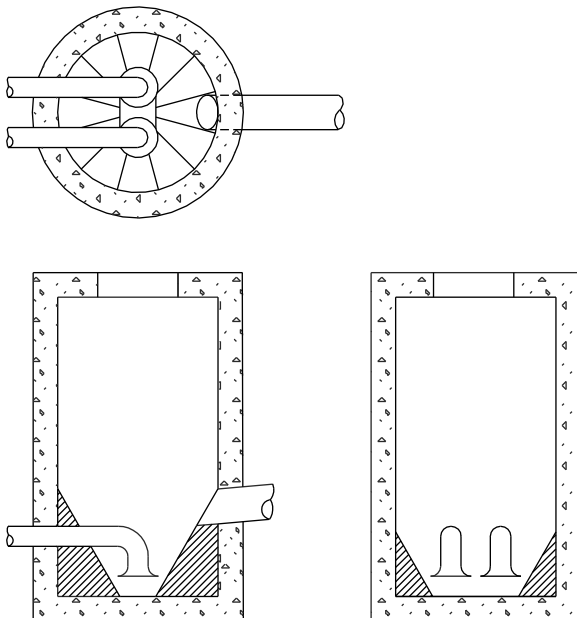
Circular wet pit with sloping walls and minimized pit horizontal floor area (dry pit pumps)
